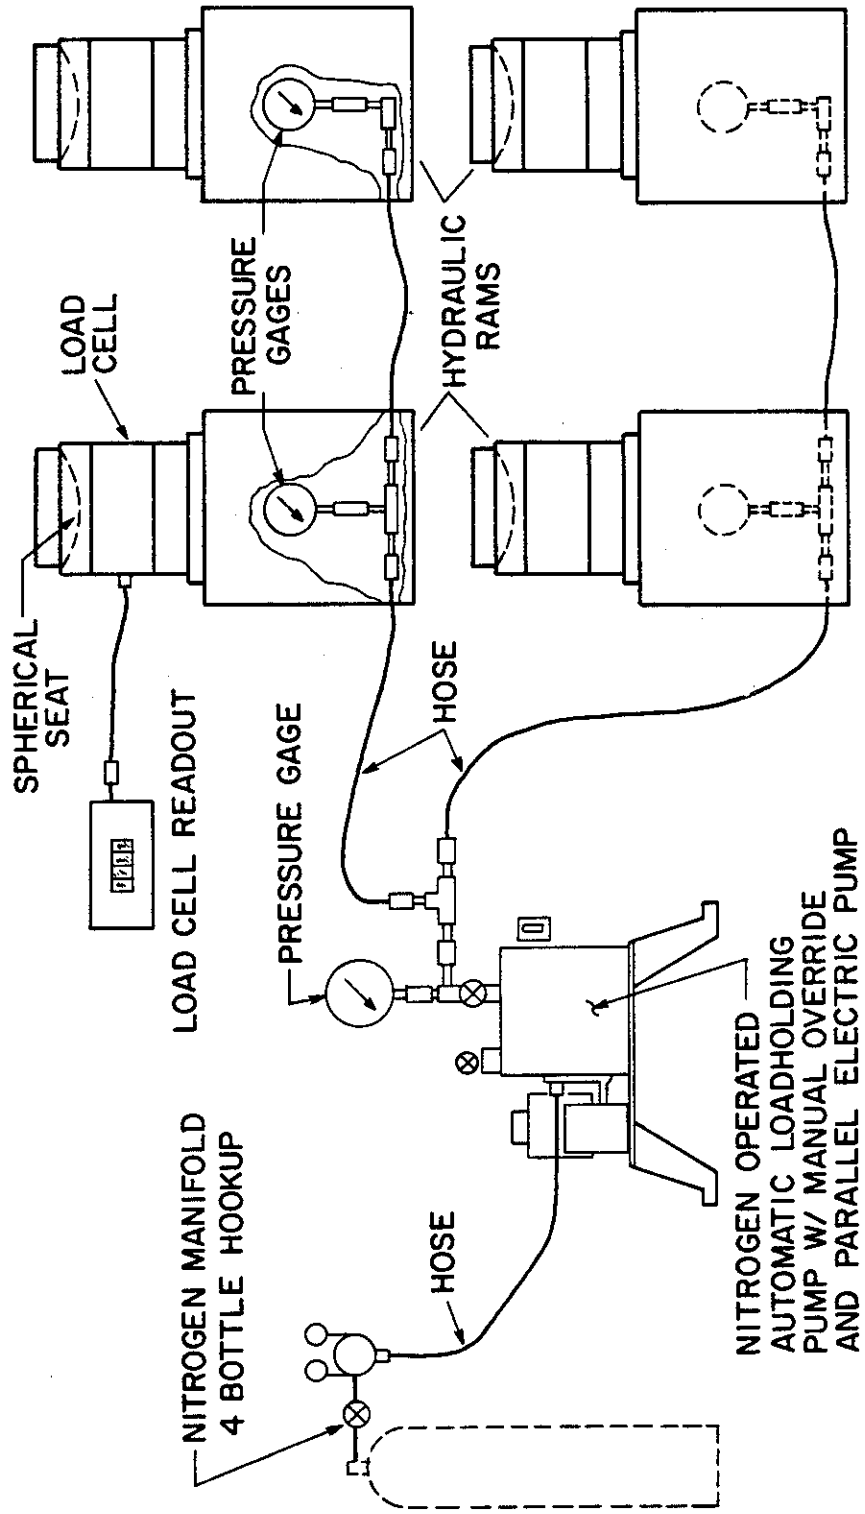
JACKING SYSTEM FOR GROUP COMPRESSION TESTS (SCHEMATIC)
